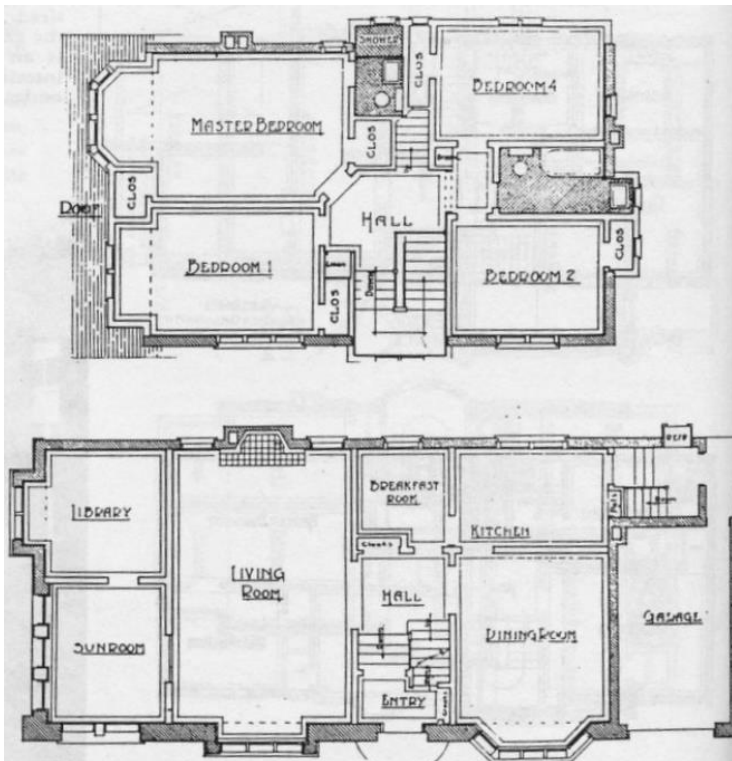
Excerpt from W. B. Galbraith's A Canadian Home Plan Book, showing the original floor plan for 55 St Edmunds Drive (A Canadian Home Plan Book, 1930)
